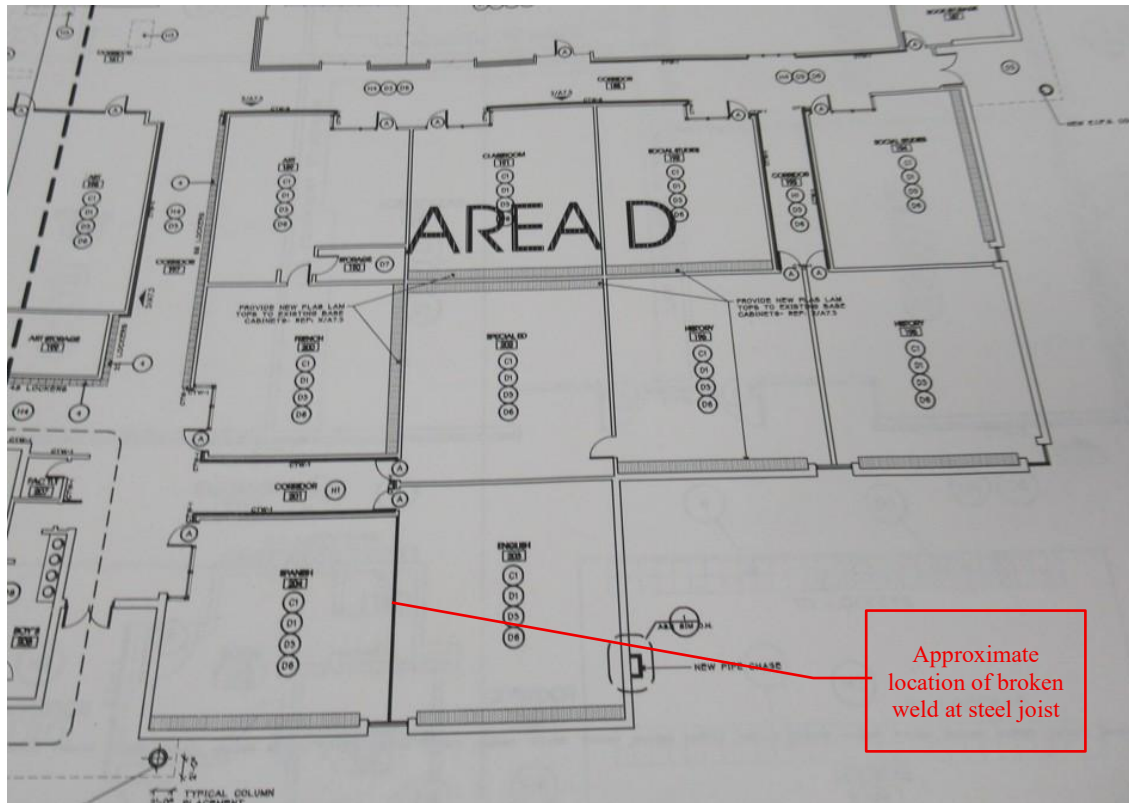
Floor Plan of Southeast Quadrant (from the 2005 New Roof and Renovation Drawings)
